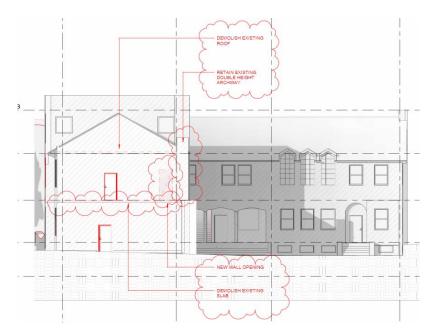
Extract from Demolition – Block 03 – Quadrangle Building Elevations – Sheet 03 showing detailed breakdown of the proposed works to the Quadrangle building.
